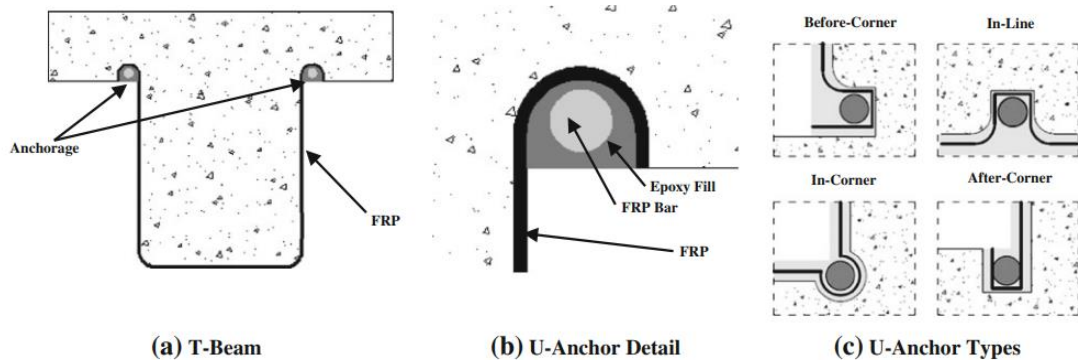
Schematic view of typical layouts of U-jackets anchor [2]
